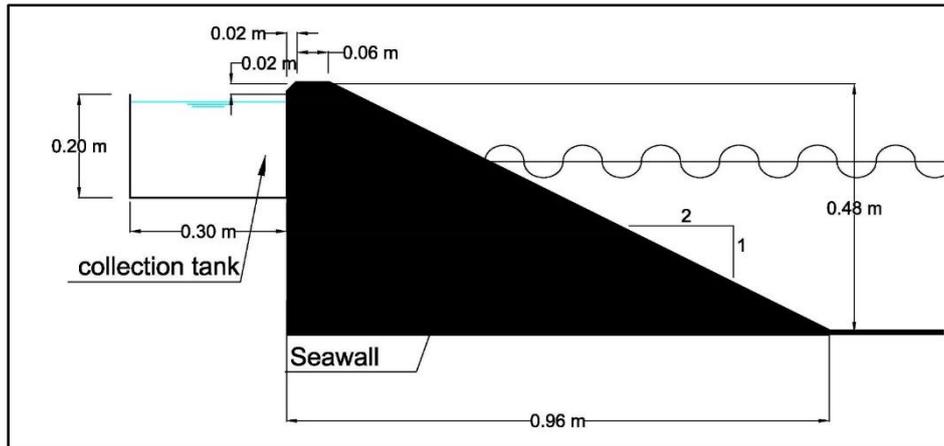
Details of model cross-section and water collection tank. (Units: centimeters).
